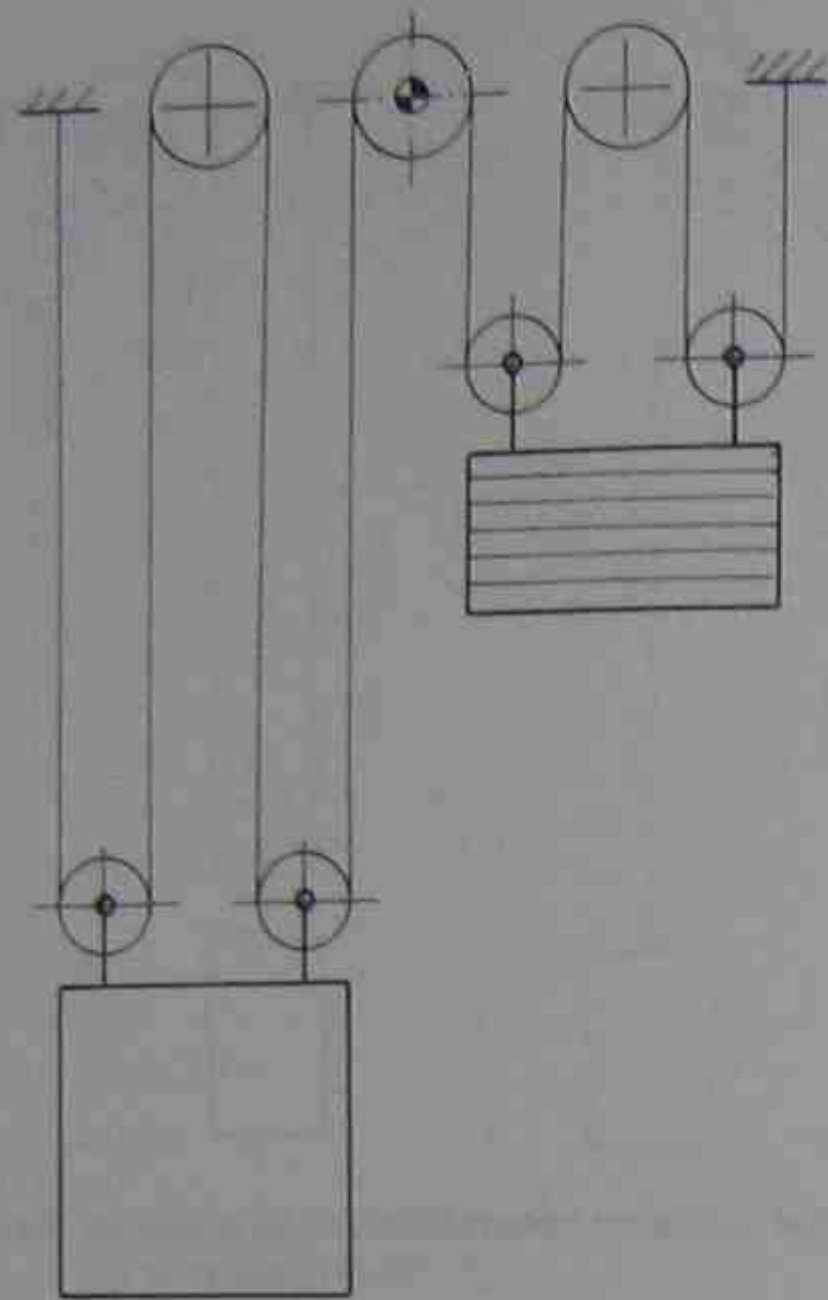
Roping system for overhead position of the machine, single wrap drive, roping factor 4.
